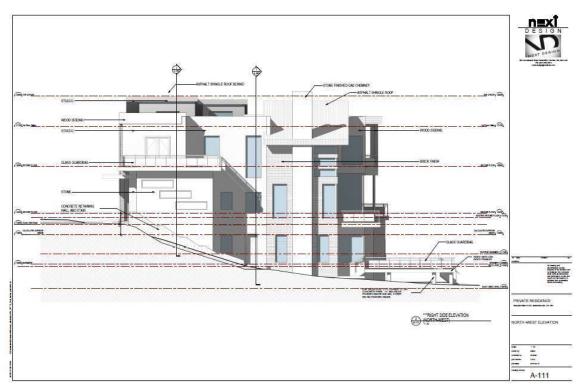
Proposed residence at 2560 Mindemoya Road, side or northwest elevation. (Image from Next Design Group, April 2018.)
